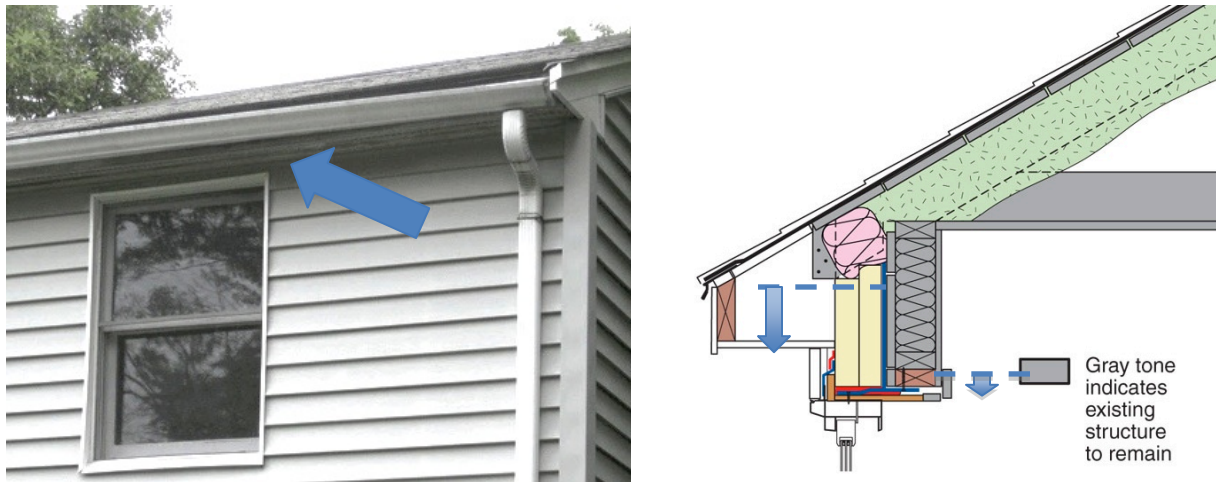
Left: Short eave overhang and limited separation between window head and soffit prior to retrofit at Test Home 1; Right: Roof overhang detail at Test Home 1 showing position of soffit and window head relative to pre-retrofit conditions.
